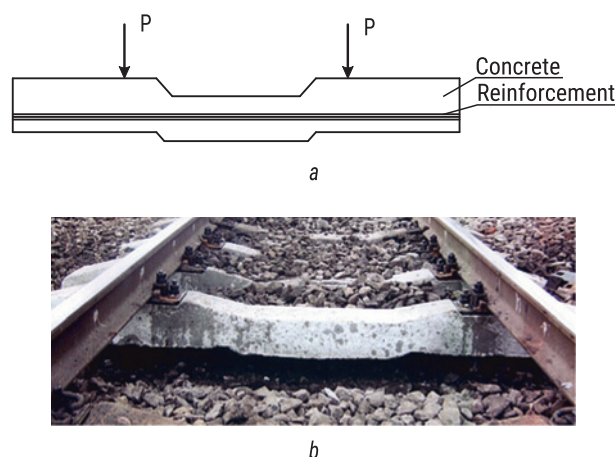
Proposed reinforced concrete sleeper: *a* – diagram of changing the location of concrete mass and pre-stressed reinforcement; *b* – view of a sleeper laid in the track
